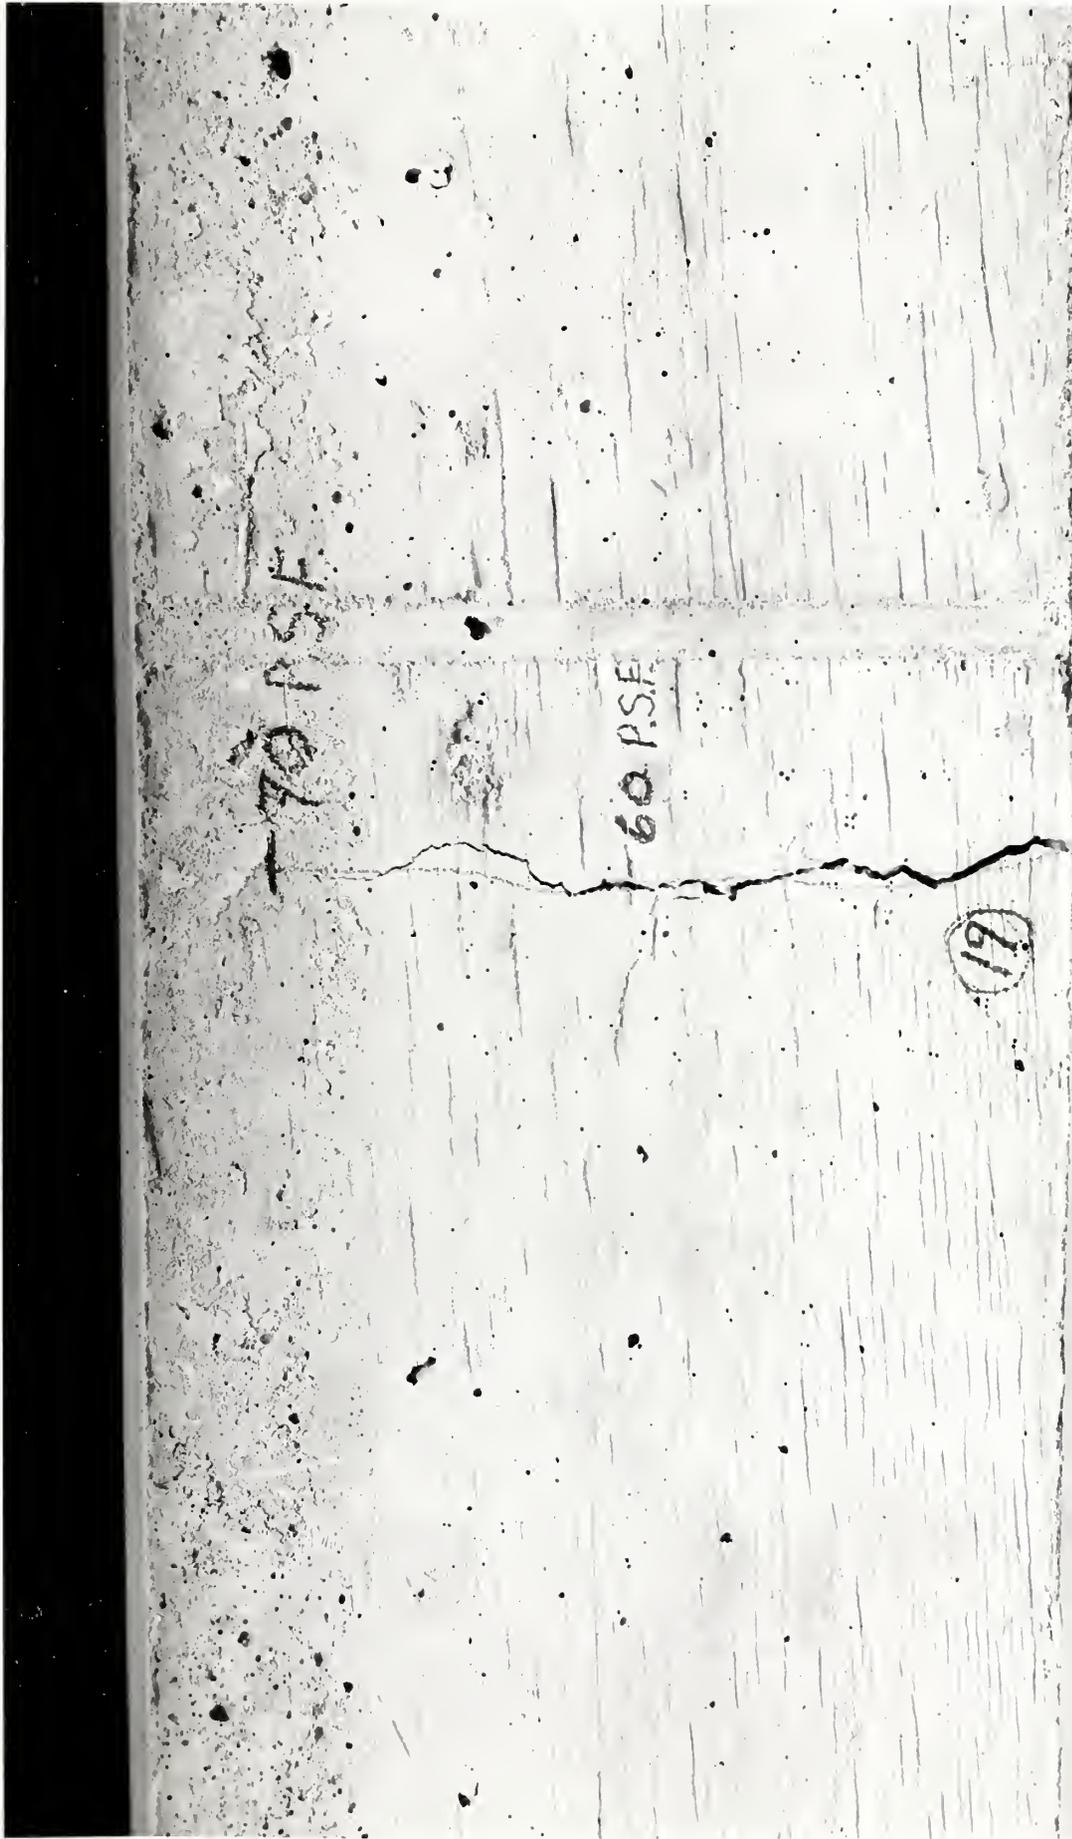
Crack in quarter-point section of east edge beam at 70 psf. (First crack opened at center section at approximately 50 psf).
